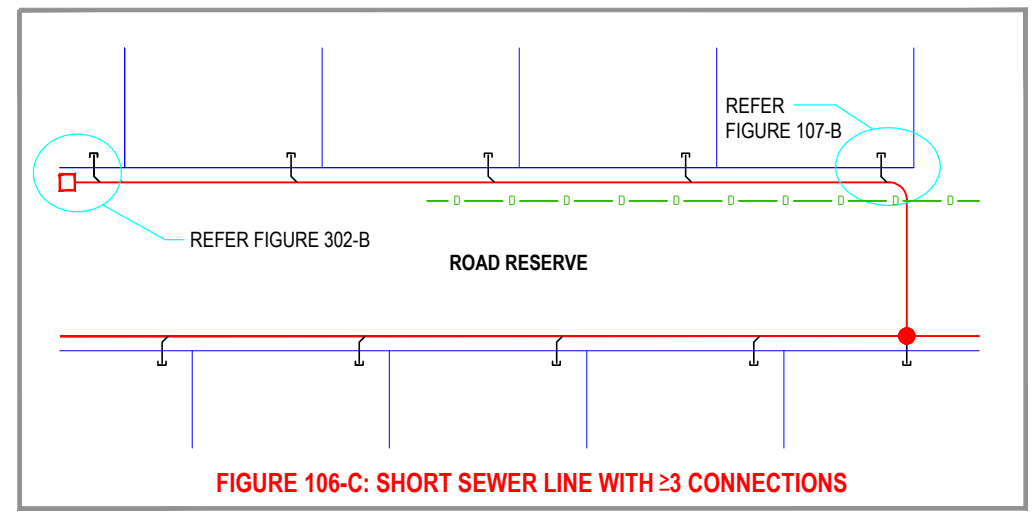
C: SHORT SEWER LINE WITH ≥3 CONNECTIONS
